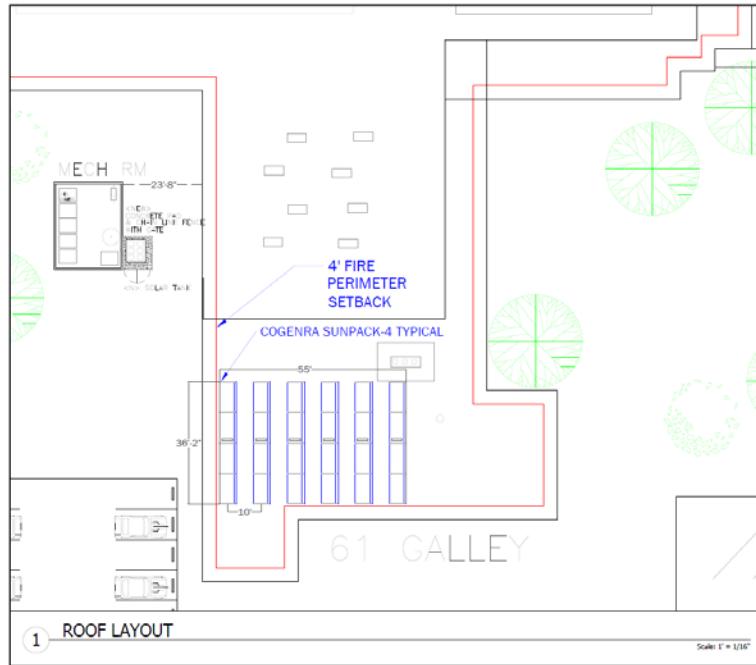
Roof layout at Port Hueneme Bldg. 61. The SunDeck rows are in a north-south axis orientation.
